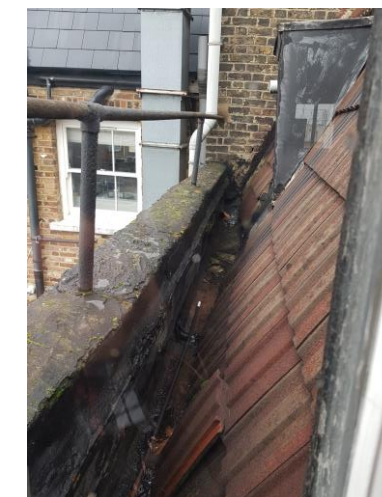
Rear facade – L03 parapet leaning towards mansard
